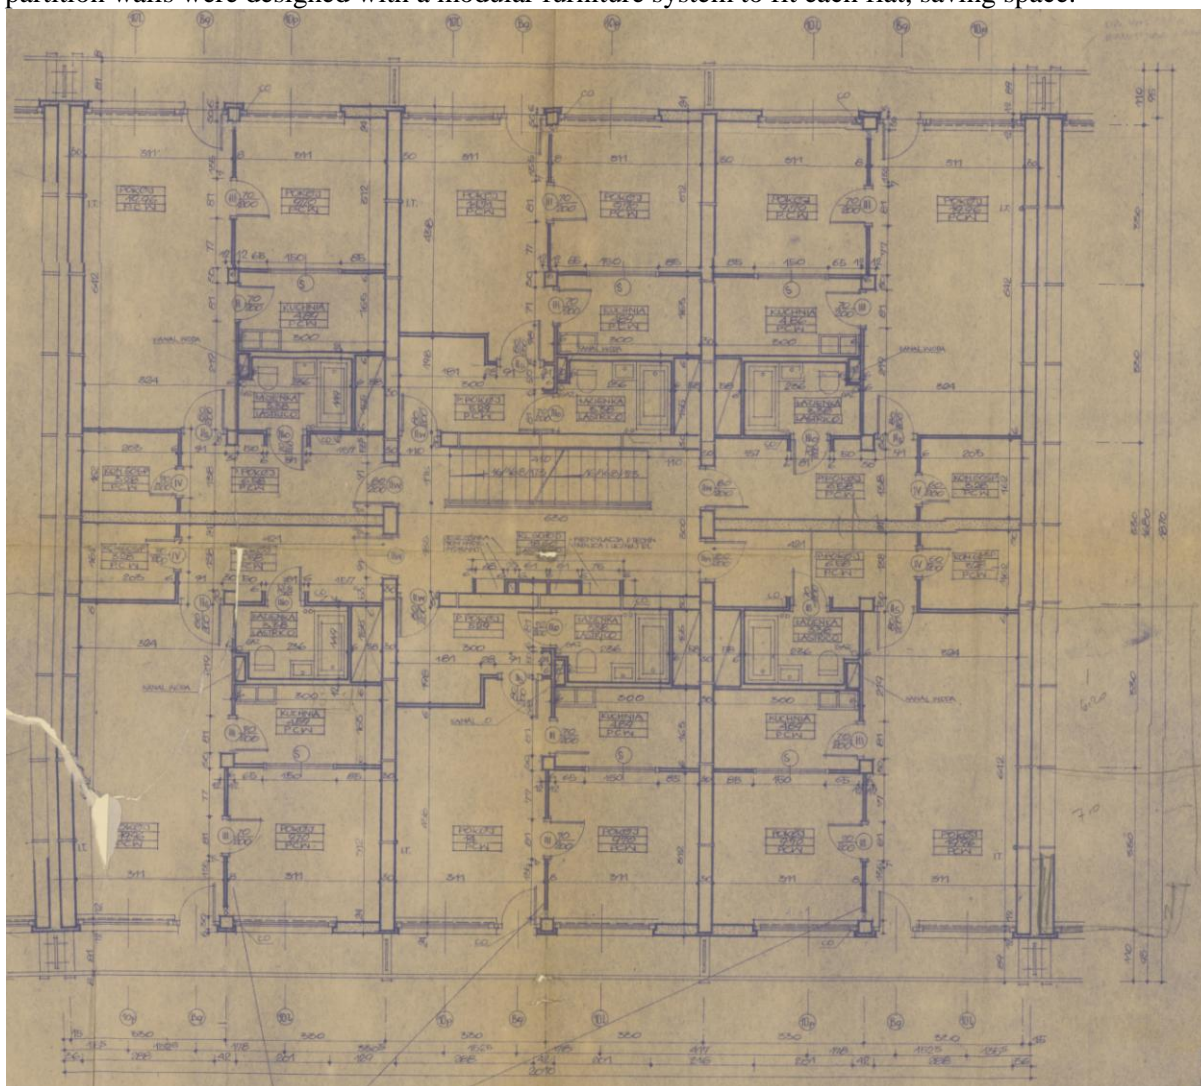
Repeated floor plan in segments C4 and C7 - fragment of the technical design (floors no. 1, 3, 4, 6, 7, 9, 10, 12, 13, 15). Designer M Król, draughtsman Z. Knosała. Source: Śląska Biblioteka Cyfrowa [33]
